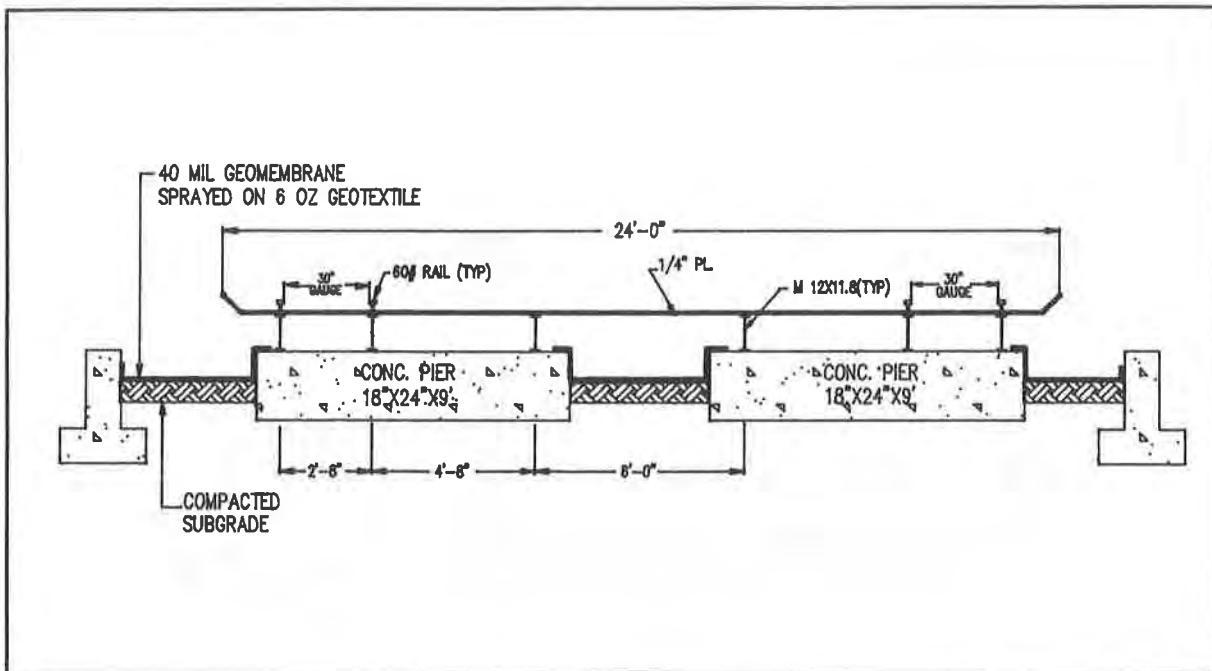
TYPICAL SECTION OF STEEL ON SOIL CONTAINMENT SYSTEM
